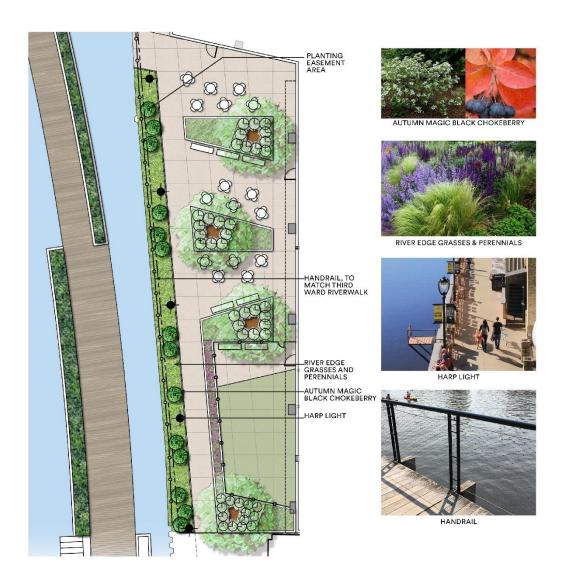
EXHIBIT E HINES LANDSCAPING PLAN (DOCKWALL)
